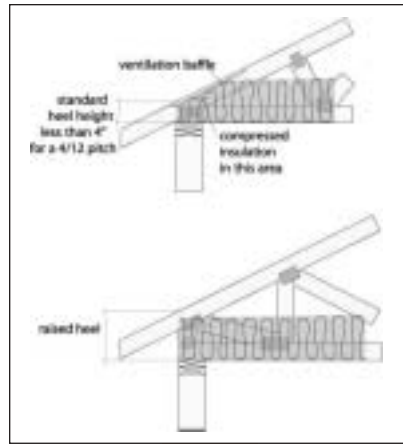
Raised heel truss allows installation of insulation all the way out to the eaves.
